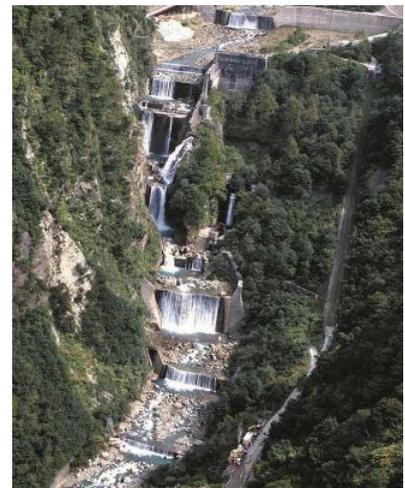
Main dam and secondary dams of Shiraiwa Sabo dam
